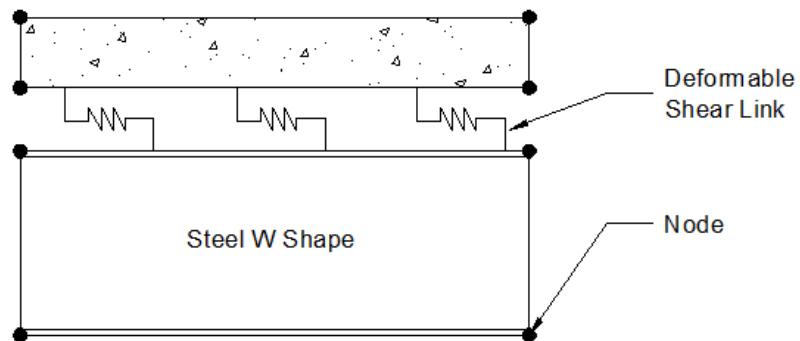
Finite Element Model with Deformable Shear Link (Ranzi, Zona 2011)
